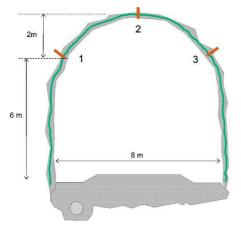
Vertical section of the Gevingås test site. Locations for monitoring of water pressure with vibrating wire piezometers in the rock mass immediately behind the waterproof SCL.
